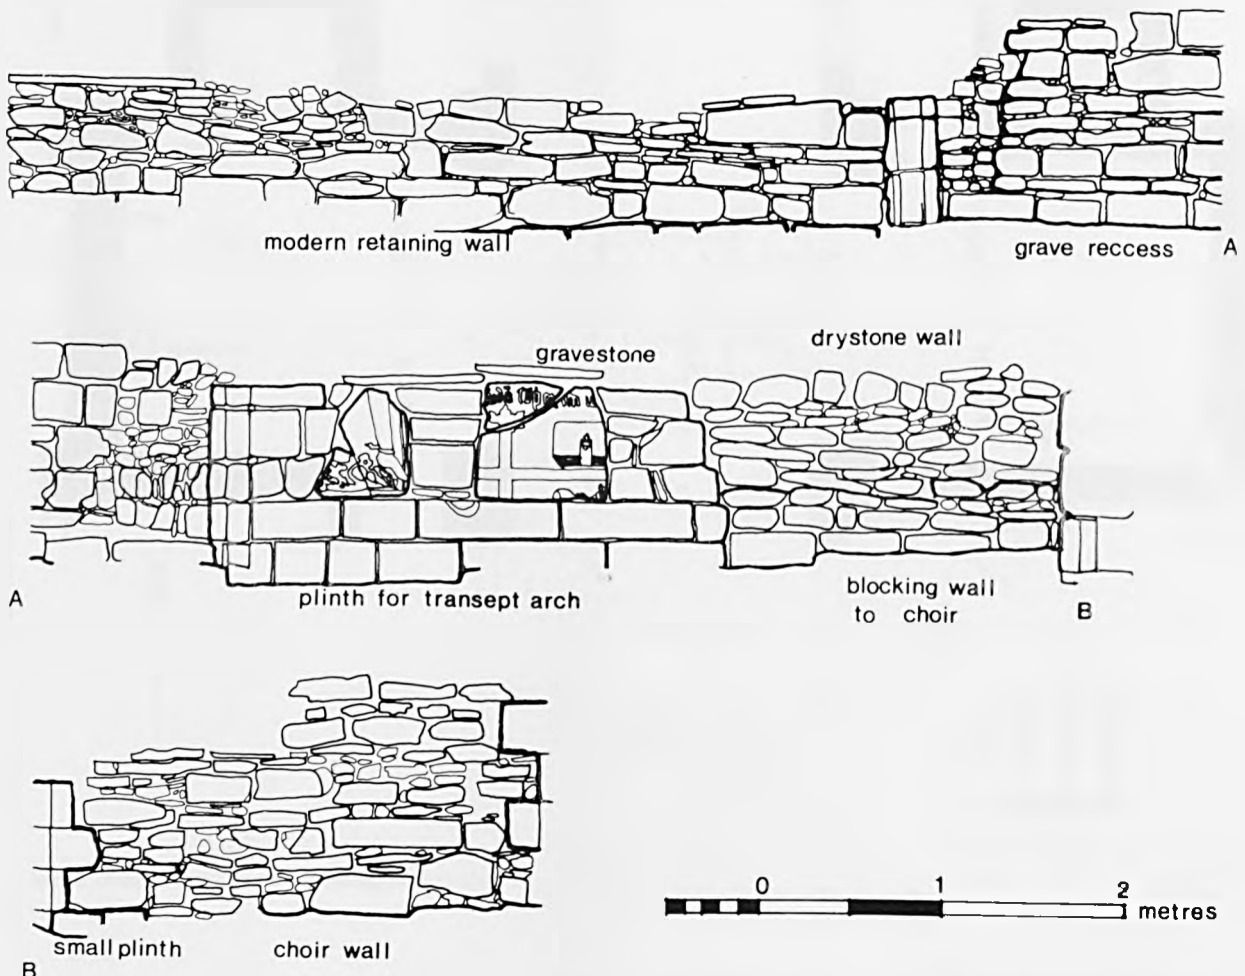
East-West elevation of the north wall of the choir, showing late medieval blocking and modern retaining wall.
